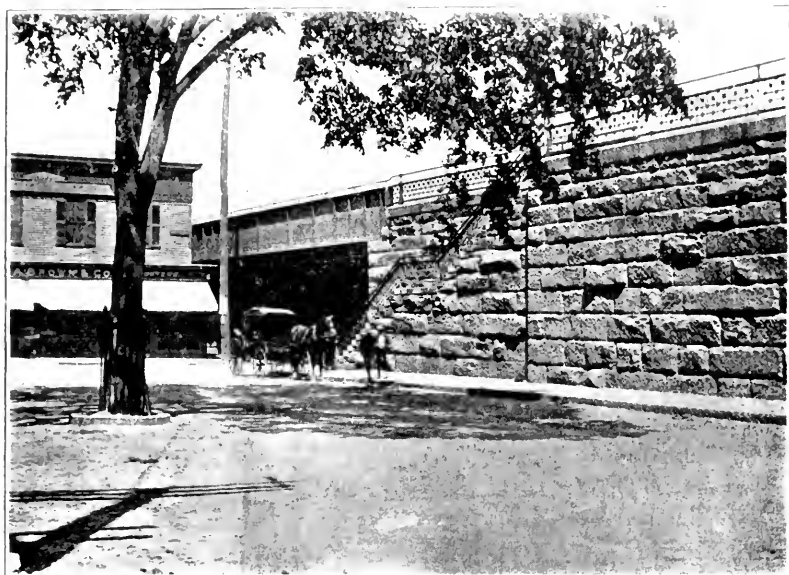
RETAINING WALL AT JAMAICA PLAIN AND GREEN STREET BRIDGE.
